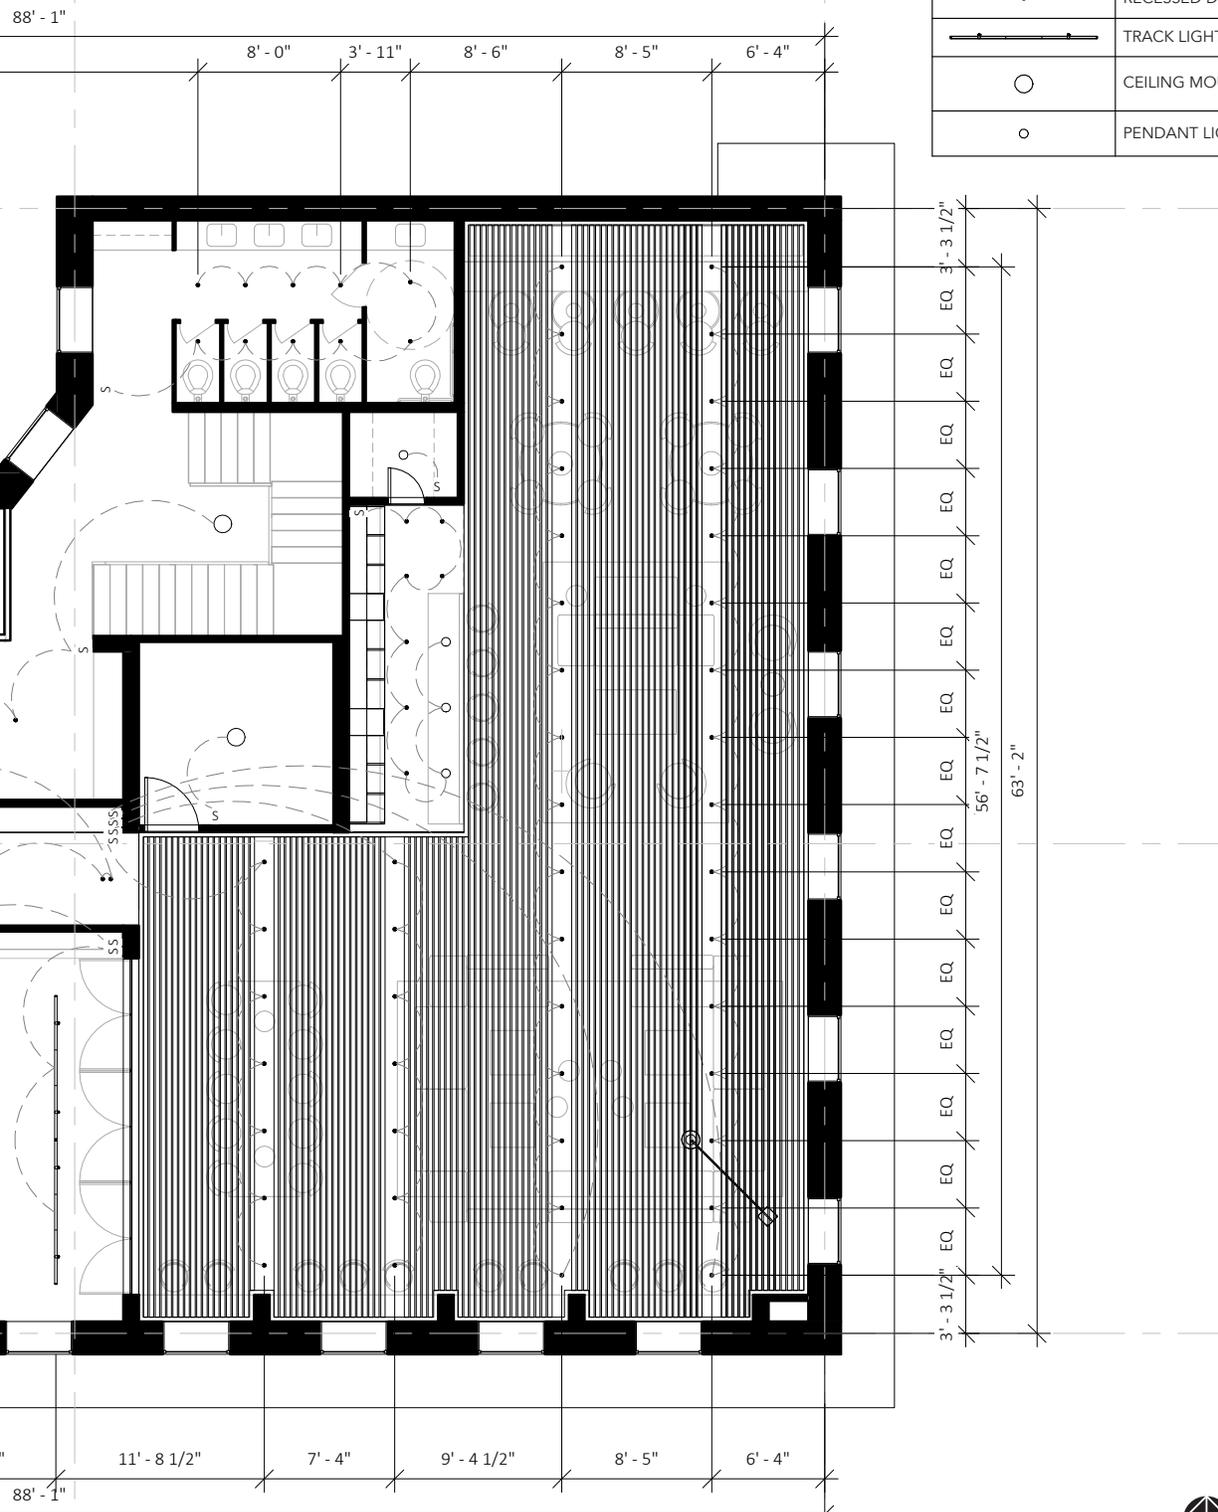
Sixth Level Reflected Ceiling Plan
